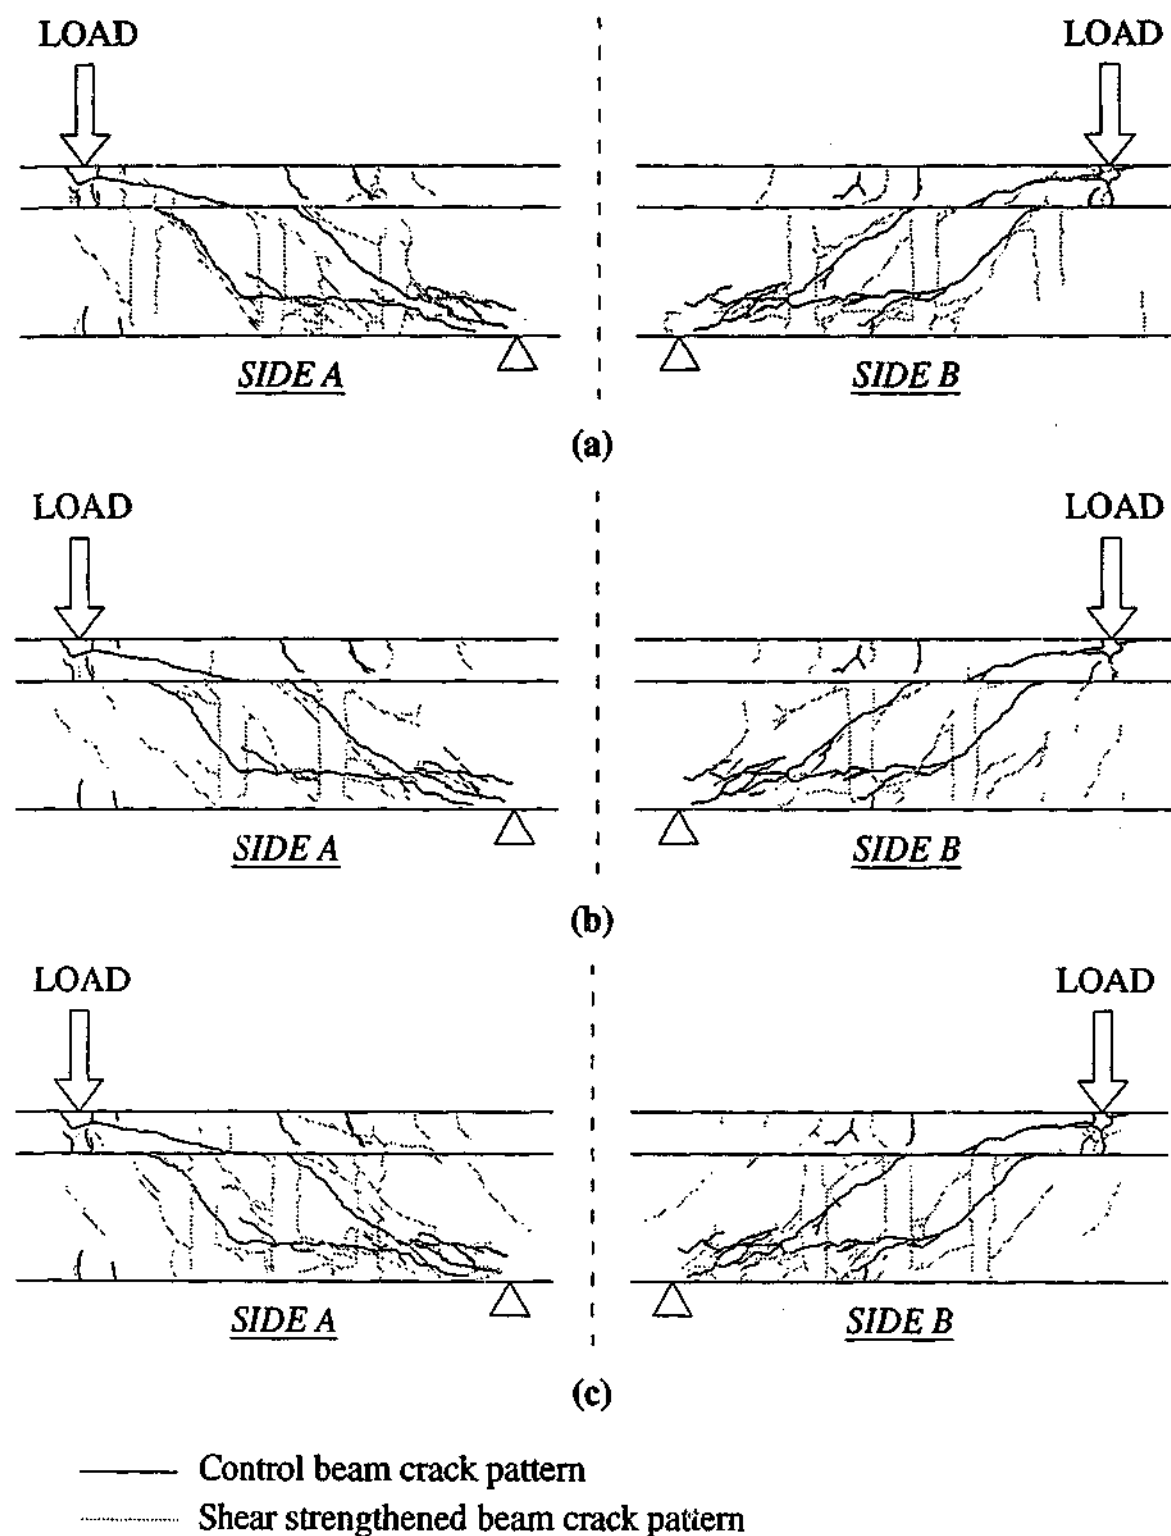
Comparison of post failure crack patterns at failure span between control beam and beams (a) '0.75D' (b) '0.60D' and (c) '0.50D'
